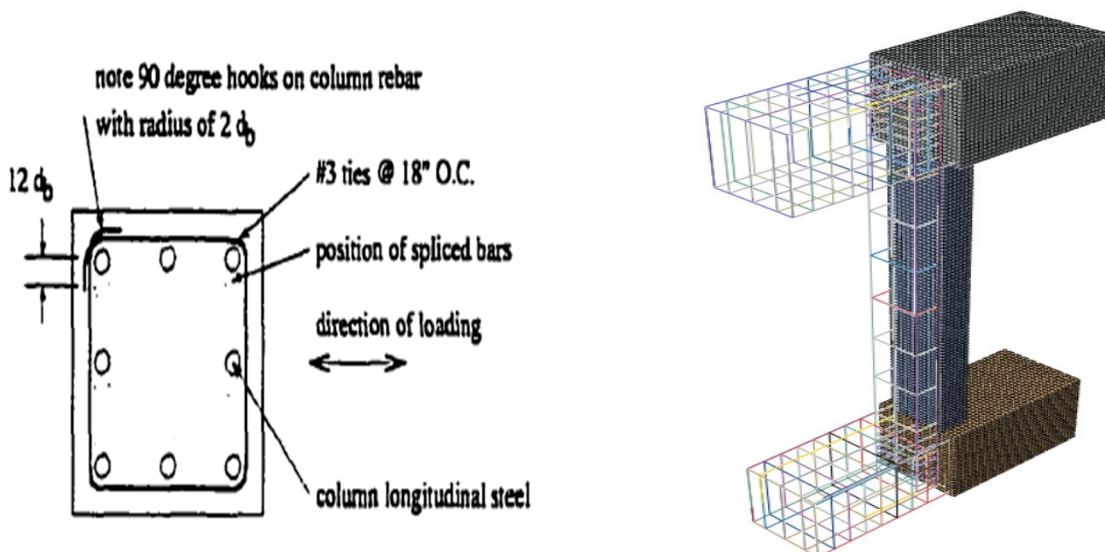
a) Cross section and reinforcement details. (1.b) Typical FE column model in Abaqus.
